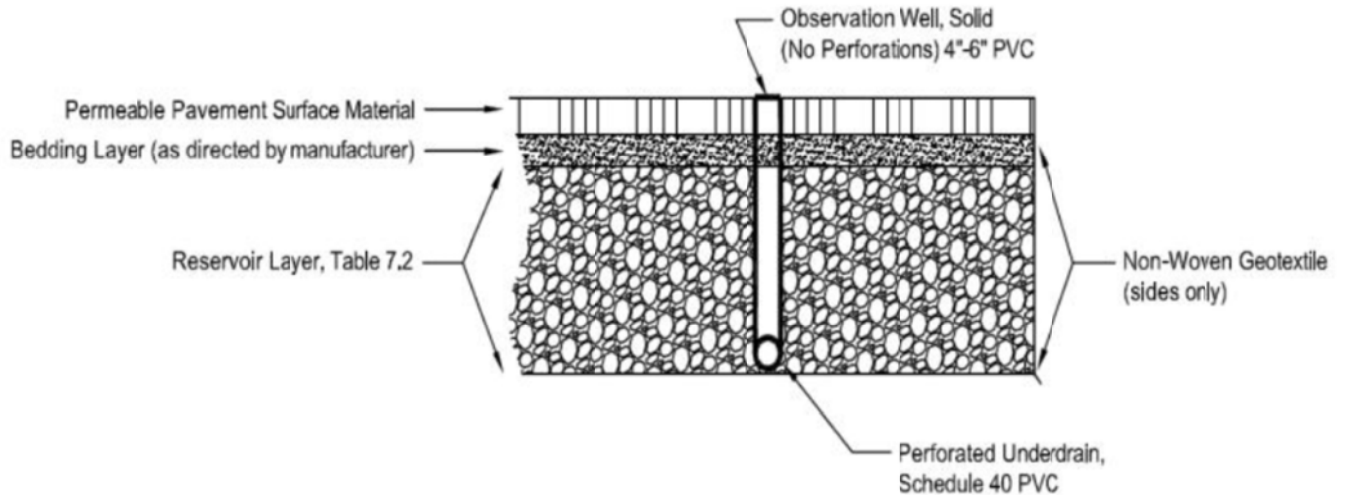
Typical Section Permeable Pavement Level 1 (Source: VADEQ, 2013)
